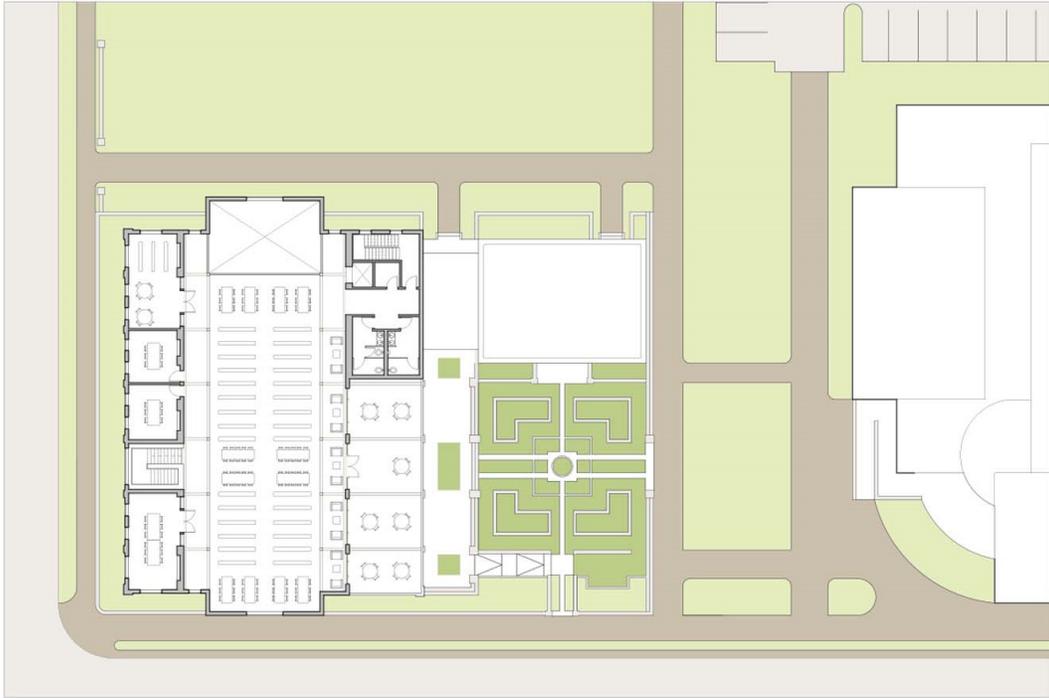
Alexandria, VA – Second floor plan, Source- Author, 2014
